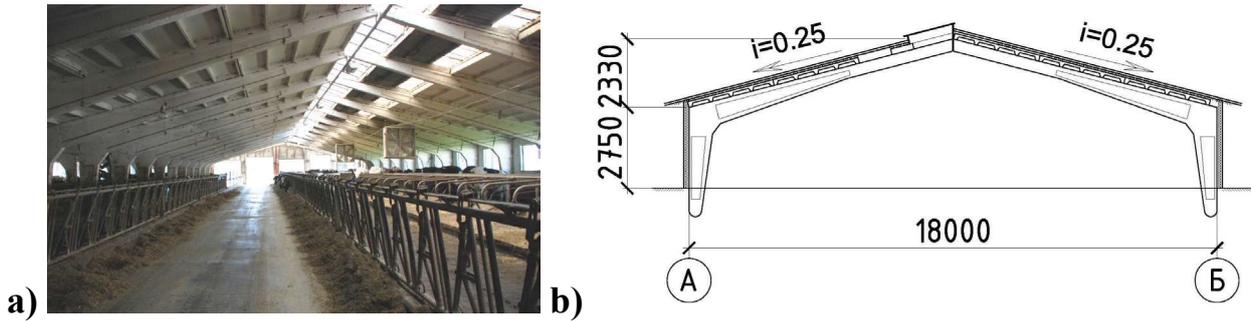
Three hinge (gable) reinforced concrete frames buildings: a) general view; b) overall dimensions
